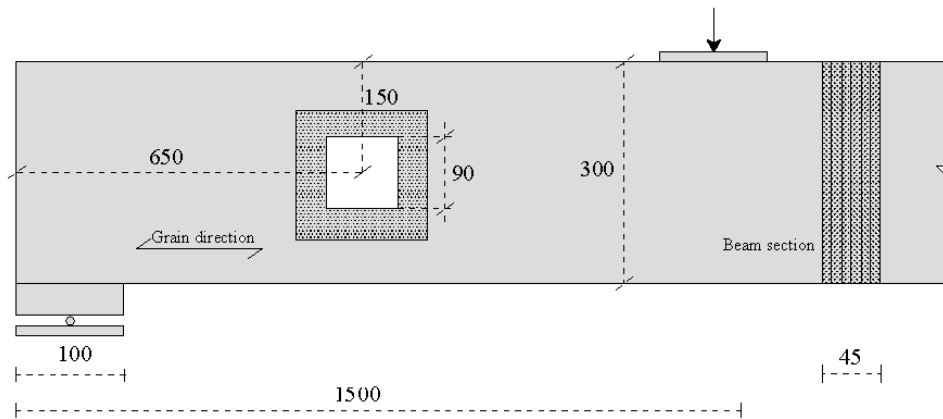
Sketch of the beam with square hole reinforced with plywood
